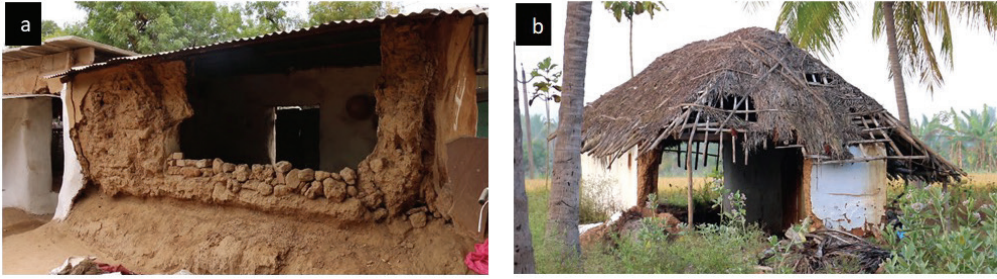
Failure of structure due to the action of rain. (a) A collapsed adobe wall in Kripampura, Jaipur that failed due to rainfall irrespective of being located in hot and dry climate and (b) An abandoned cob house in Sittlingi, Tamil Nadu.
